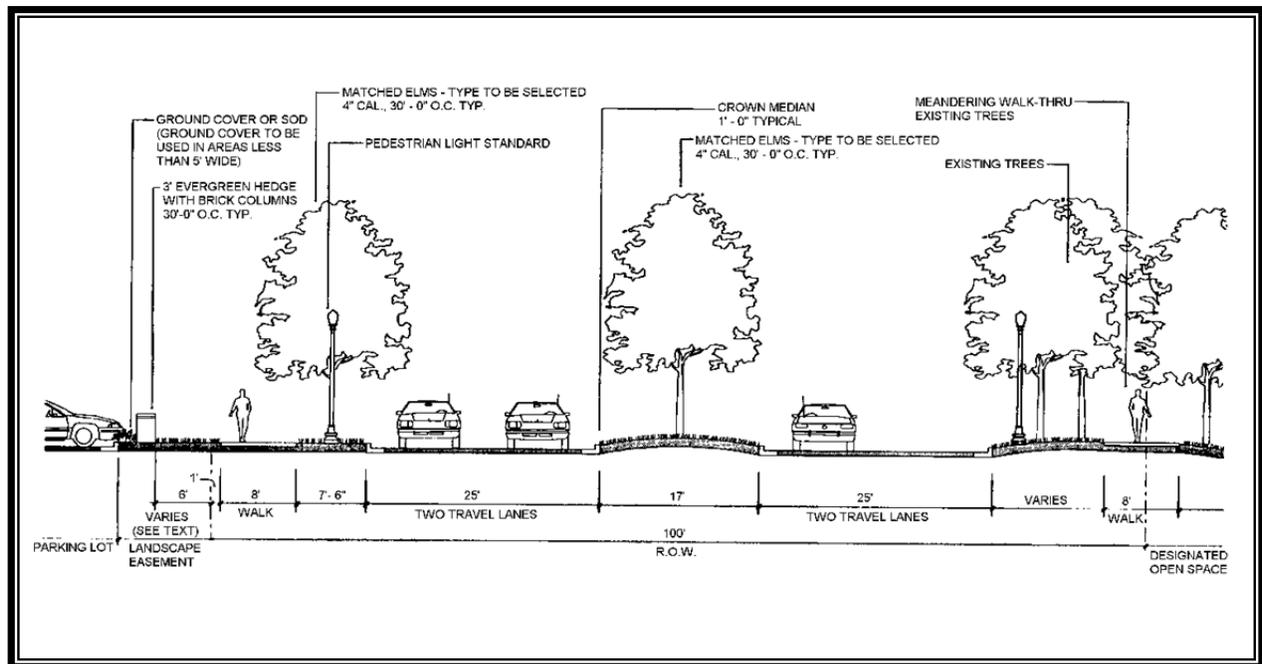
Bear Creek Parkway (Divided Cross Section)
